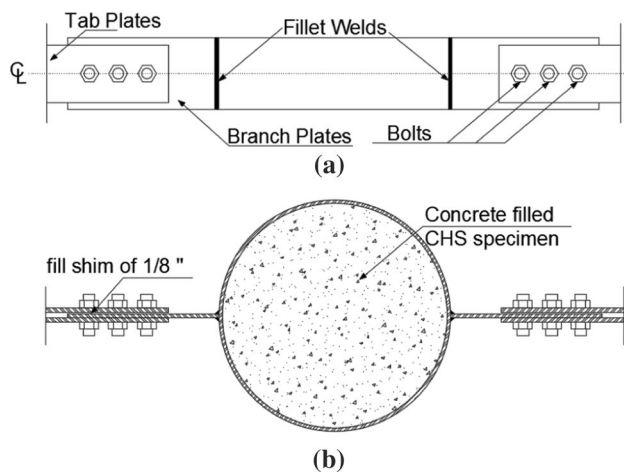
CHS connections details (16" diameter specimen): a top view; b side view
